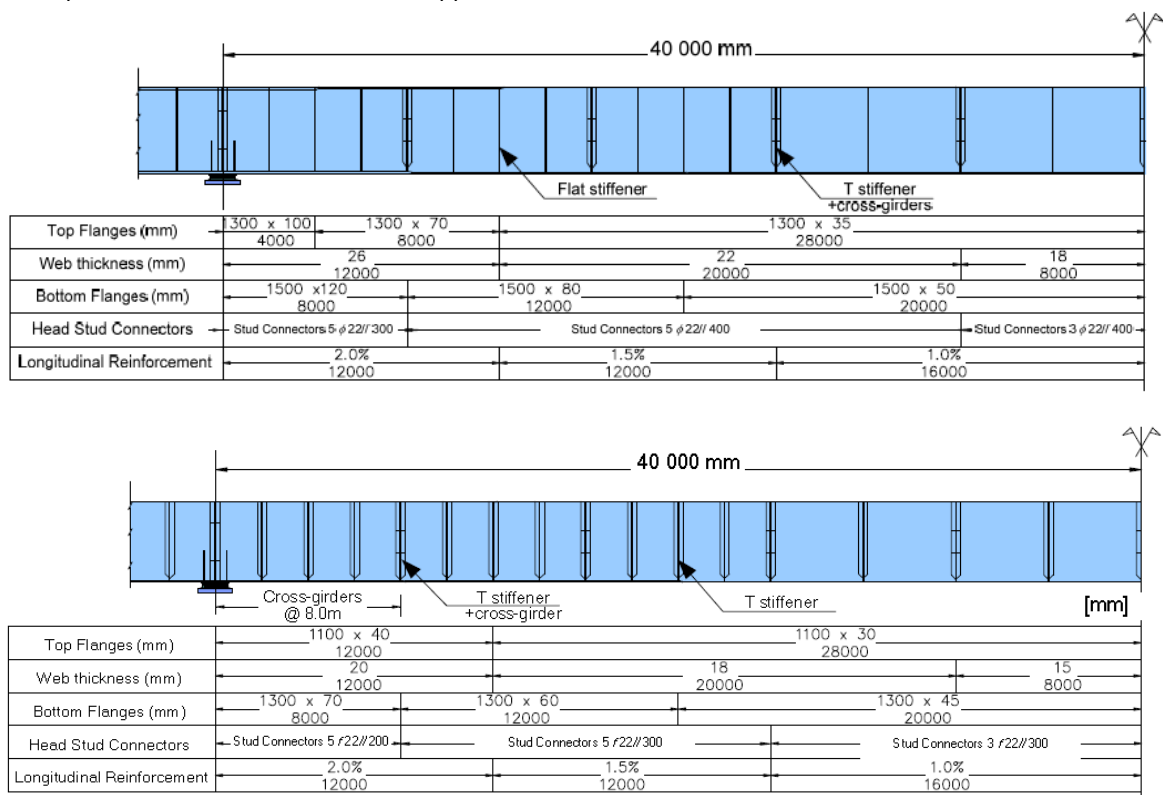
Structural steel distribution for the main girder typical span (S355 and S690, respectively) (source: OPTIBRI [5]).
